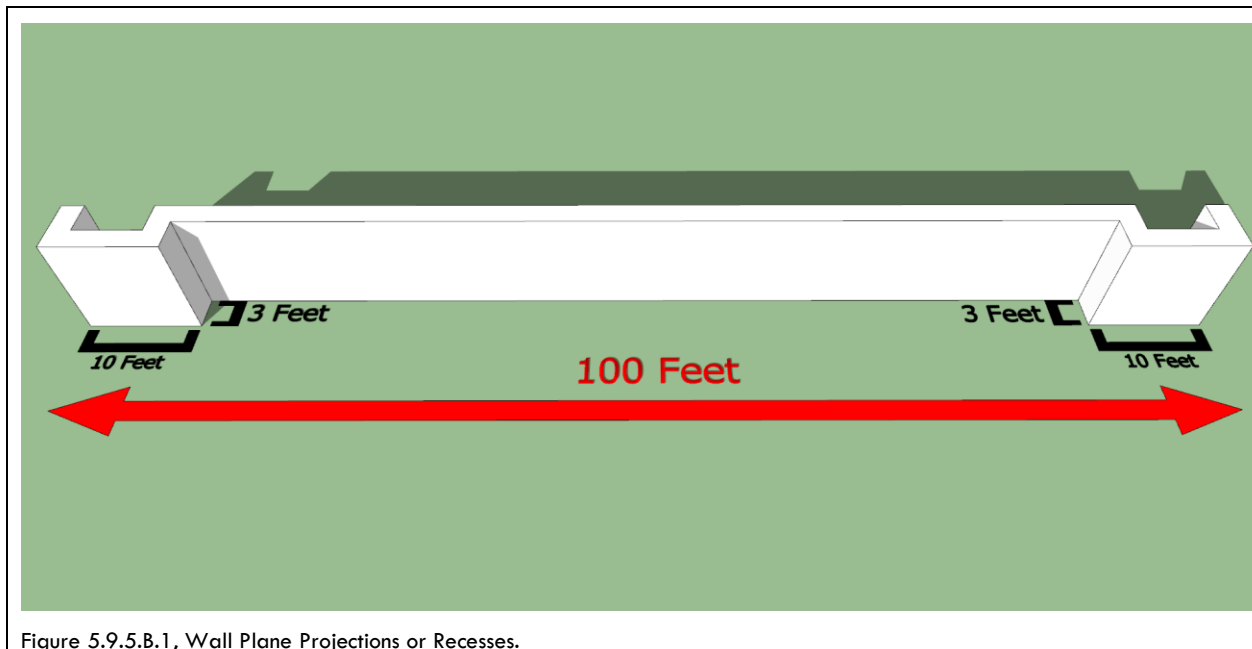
B.1, Wall Plane Projections or Recesses.
